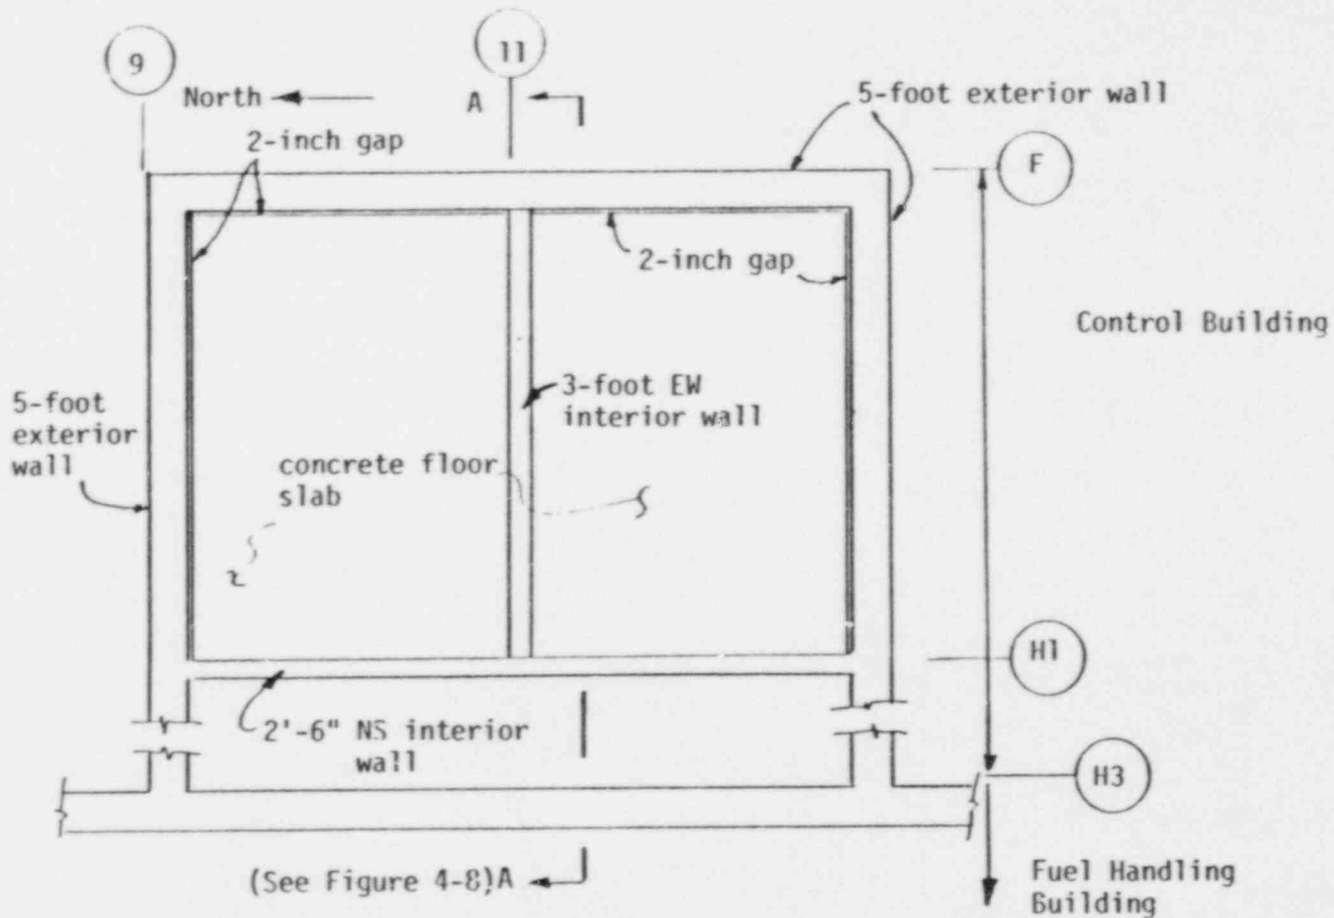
CONTROL BUILDING TYPICAL FLOOR PLAN
